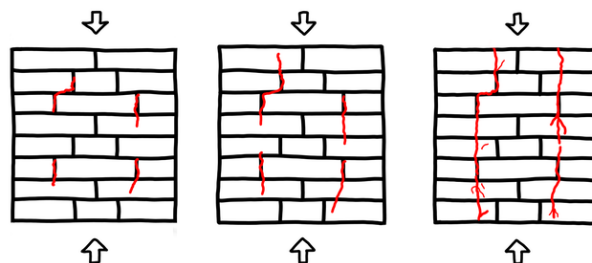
Typical crack pattern of a compressed masonry wall
